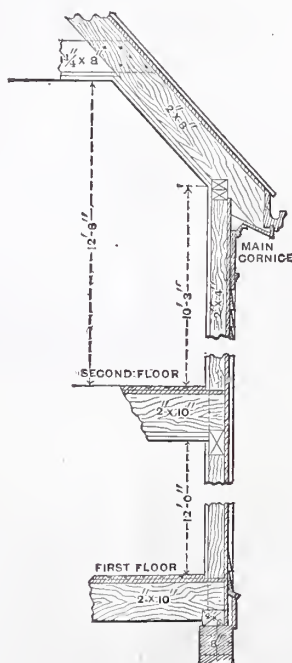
Section Showing Story Heights, Cornice and Gutter.—Scale, $\frac{1}{4}$ Inch to the Foot.
